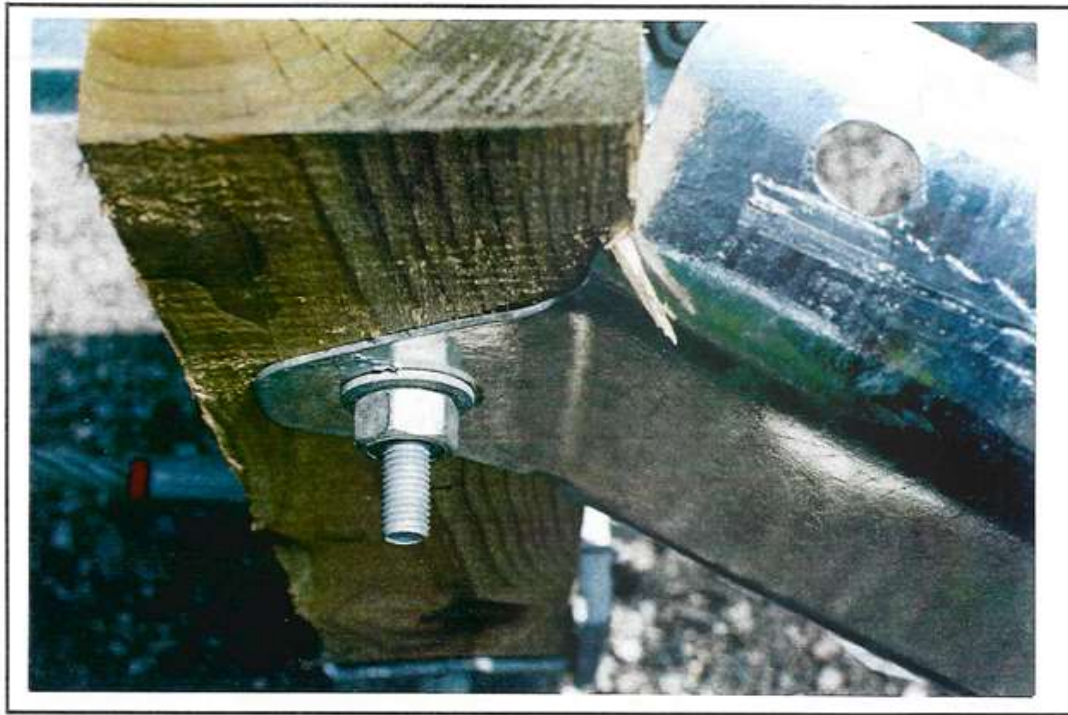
Condition:* Bent Rail (Cracked or Broken Galvanization)
